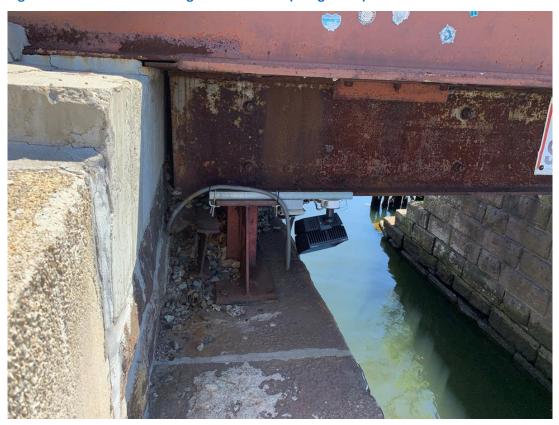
MP 5.11 - UG Bridge - Clark's Cove (Superstructure/Abutment)
